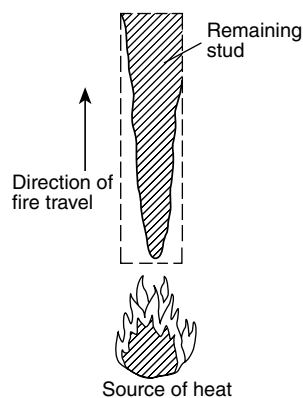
(b) Cross section of wood wall stud pointing toward fire.
